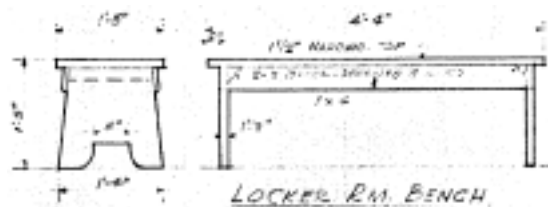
DETAIL OF RESTROOM BENCHES. UNDATED DRAWING COURTESY OF THE WASHINGTON MILITARY DEPARTMENT.
